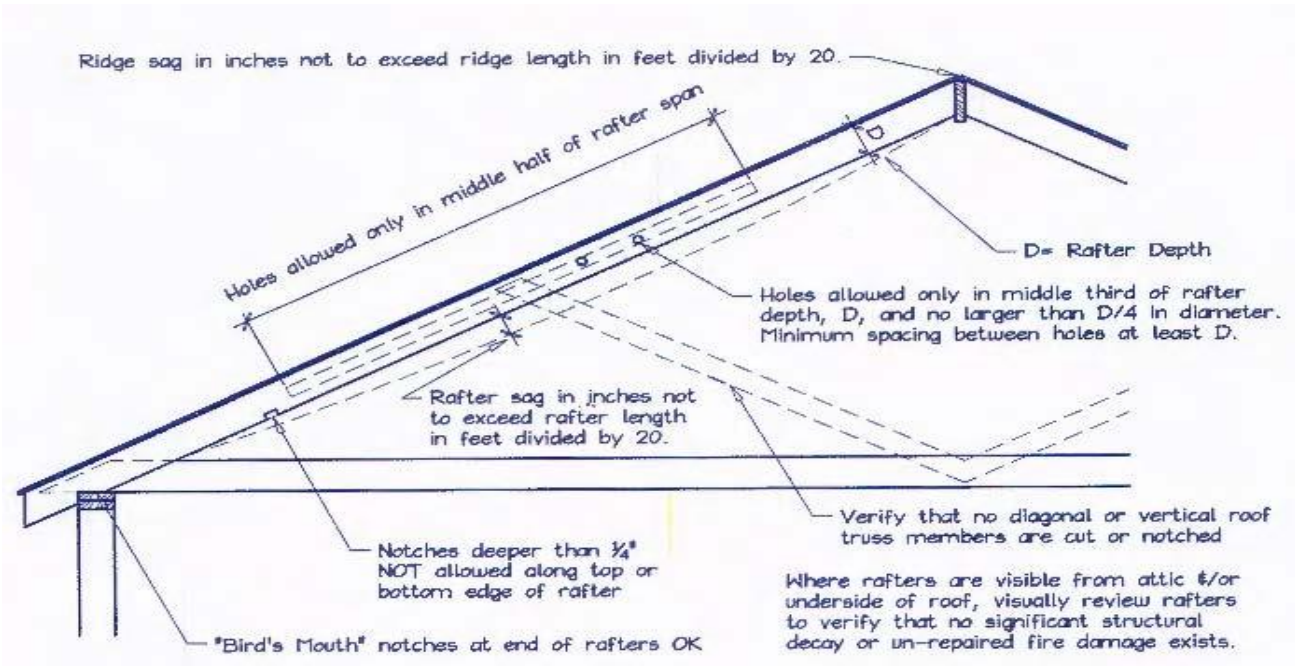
Roof Visual Structural Review (Contractor's Site Audit) of Existing Conditions.
